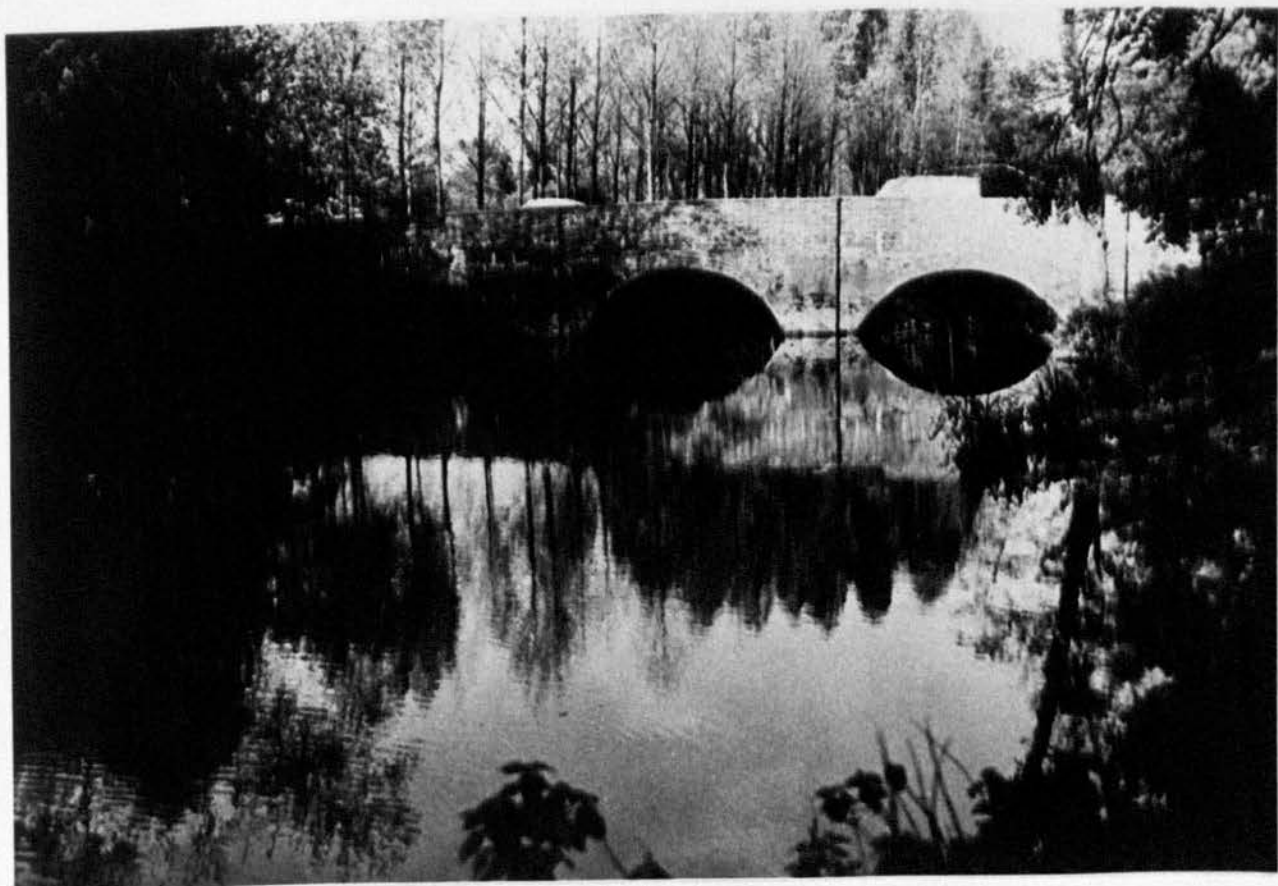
Downstream Face of Betchworth Bridge - Low Flow.
